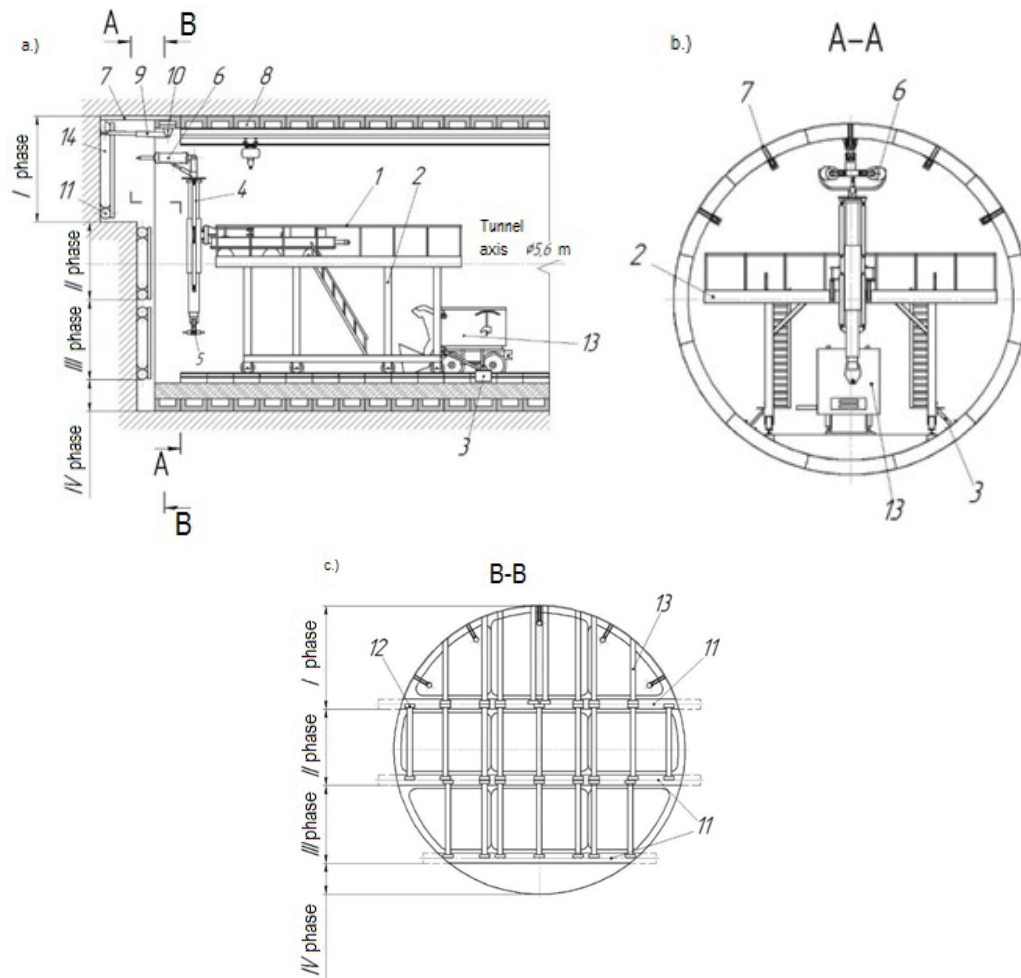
The tunneling system for the relieving tunnel driving with tubing lining: a) general view of the system; b) Sectional drawing A-A (mine face view); c) Sectional drawing B-B (tunneling system view).
